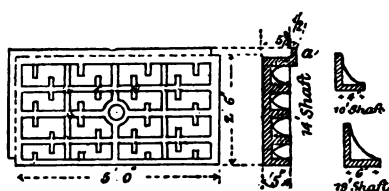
Tubing-plate, design B, back elevation and vertical section.
